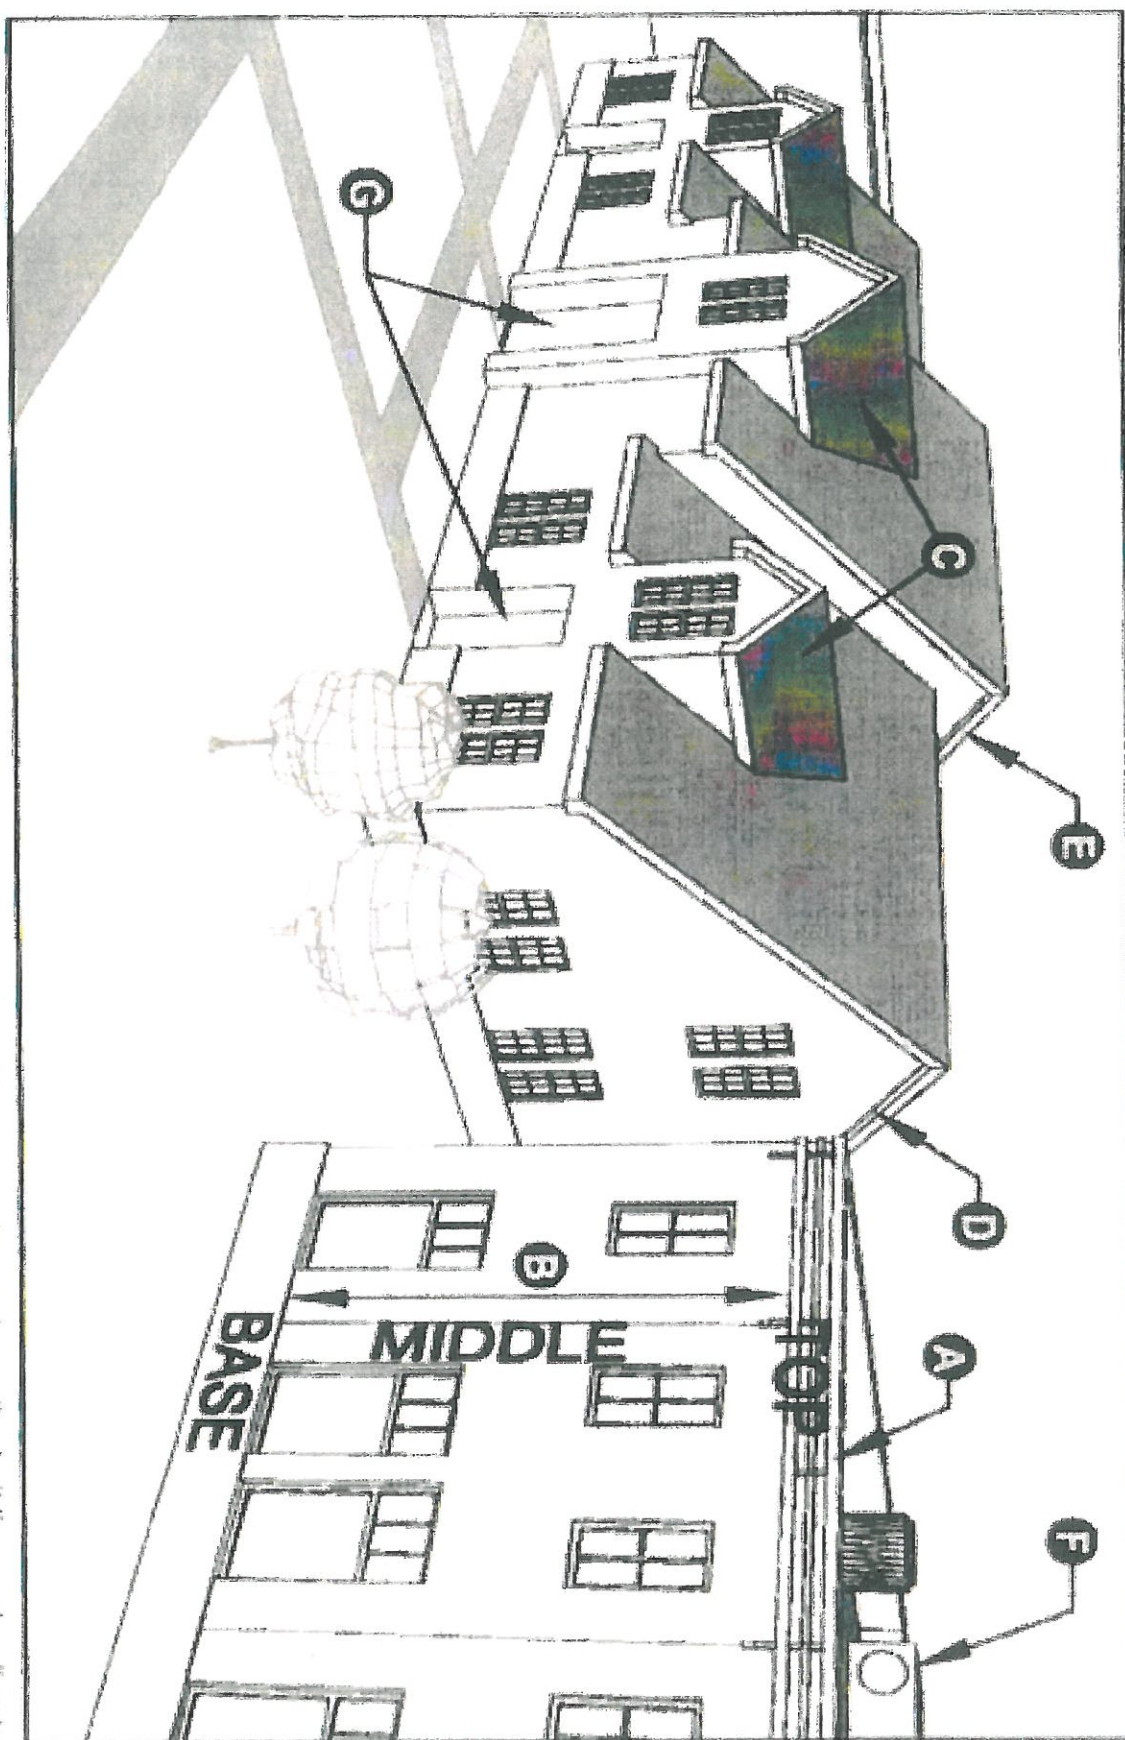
Different Roof Configurations. A well designed building roof provides screening, reduces the building scale, diverts the fall of rainwater, highlights important areas and creates a graceful "cap" to the structure, among other things.
